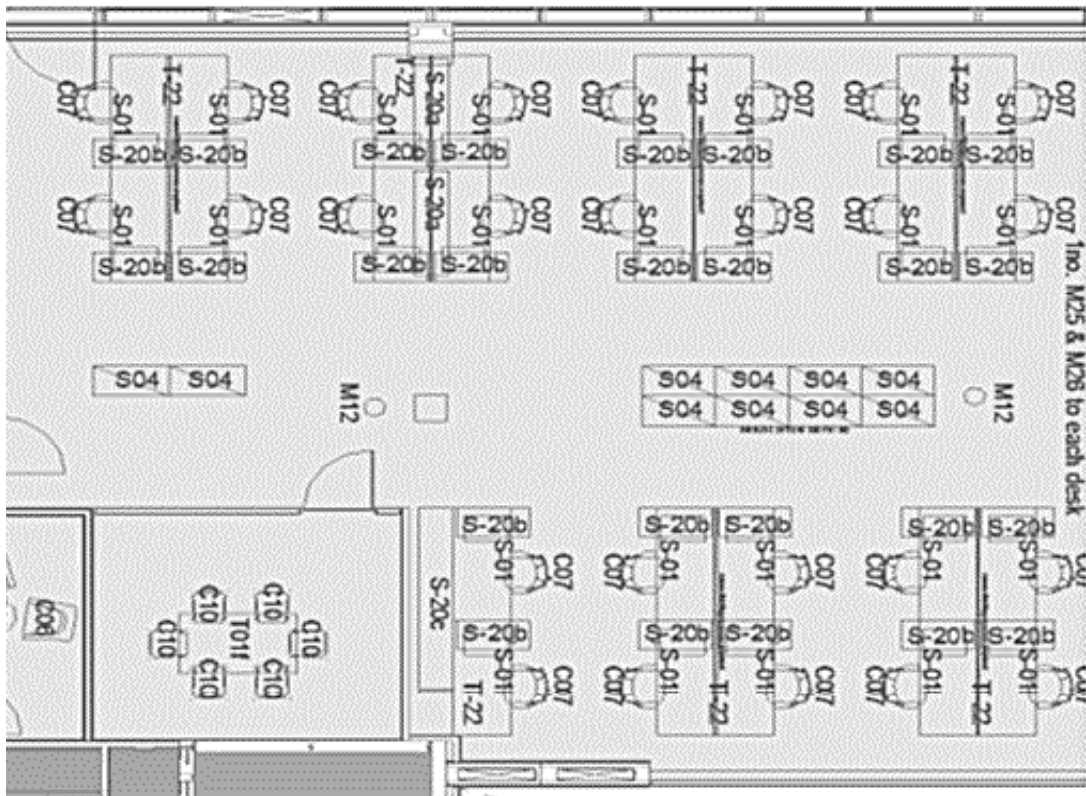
Typical layout of open-plan office space within the Brooks Building
